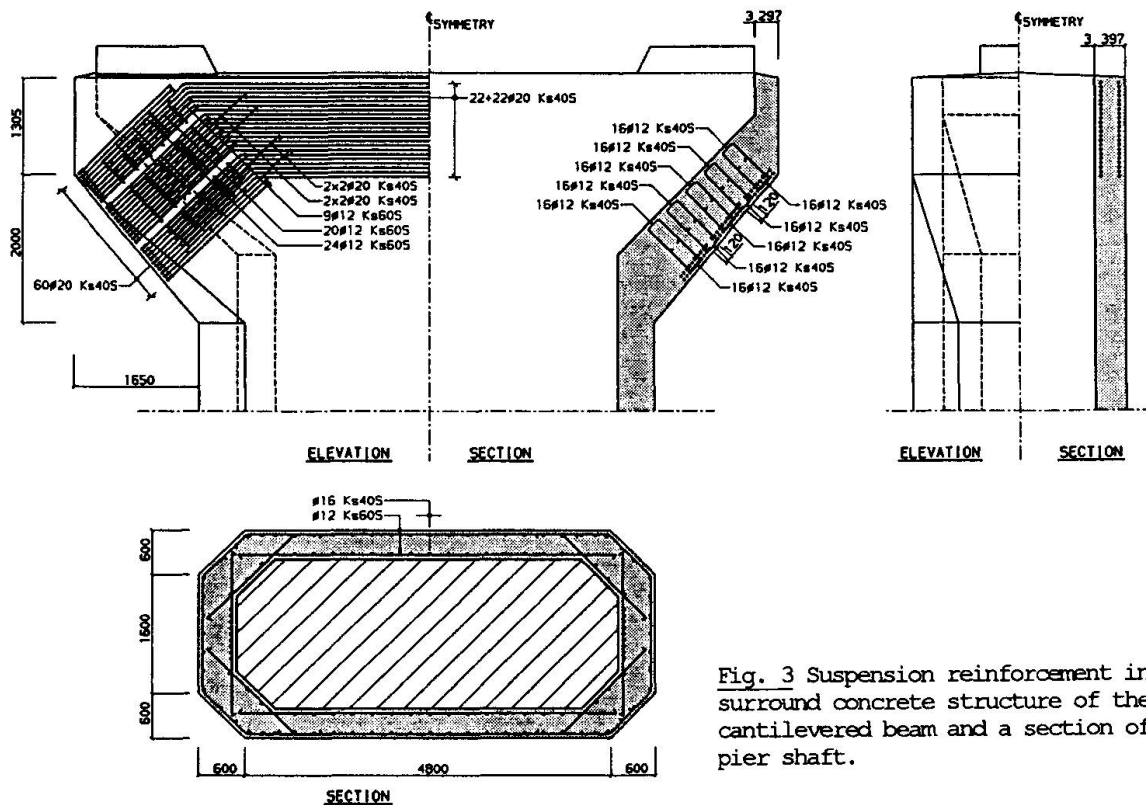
Suspension reinforcement in the surround concrete structure of the cantilevered beam and a section of the pier shaft.
